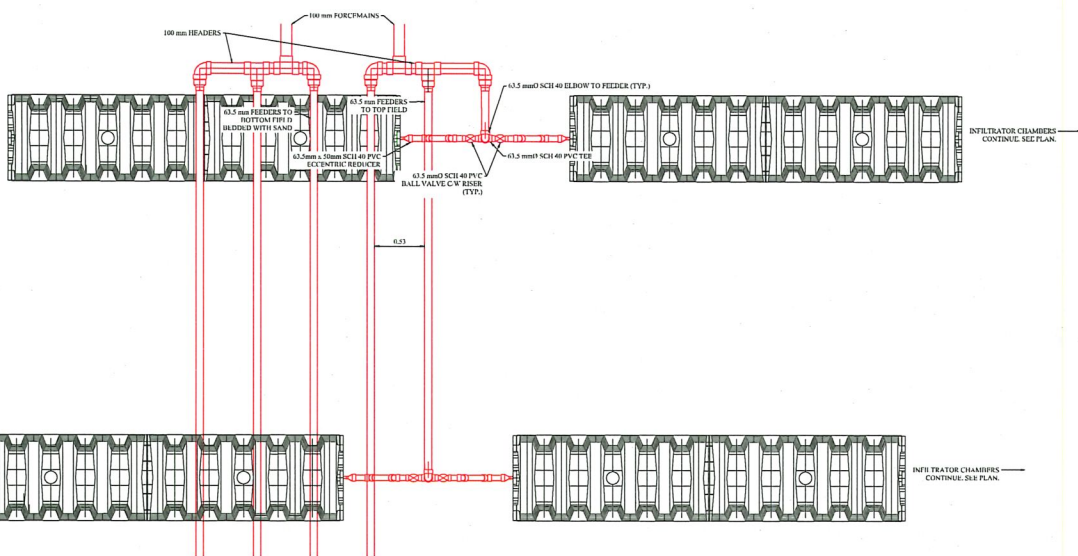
SIDE VIEW AT CENTRE WITH FEEDER
